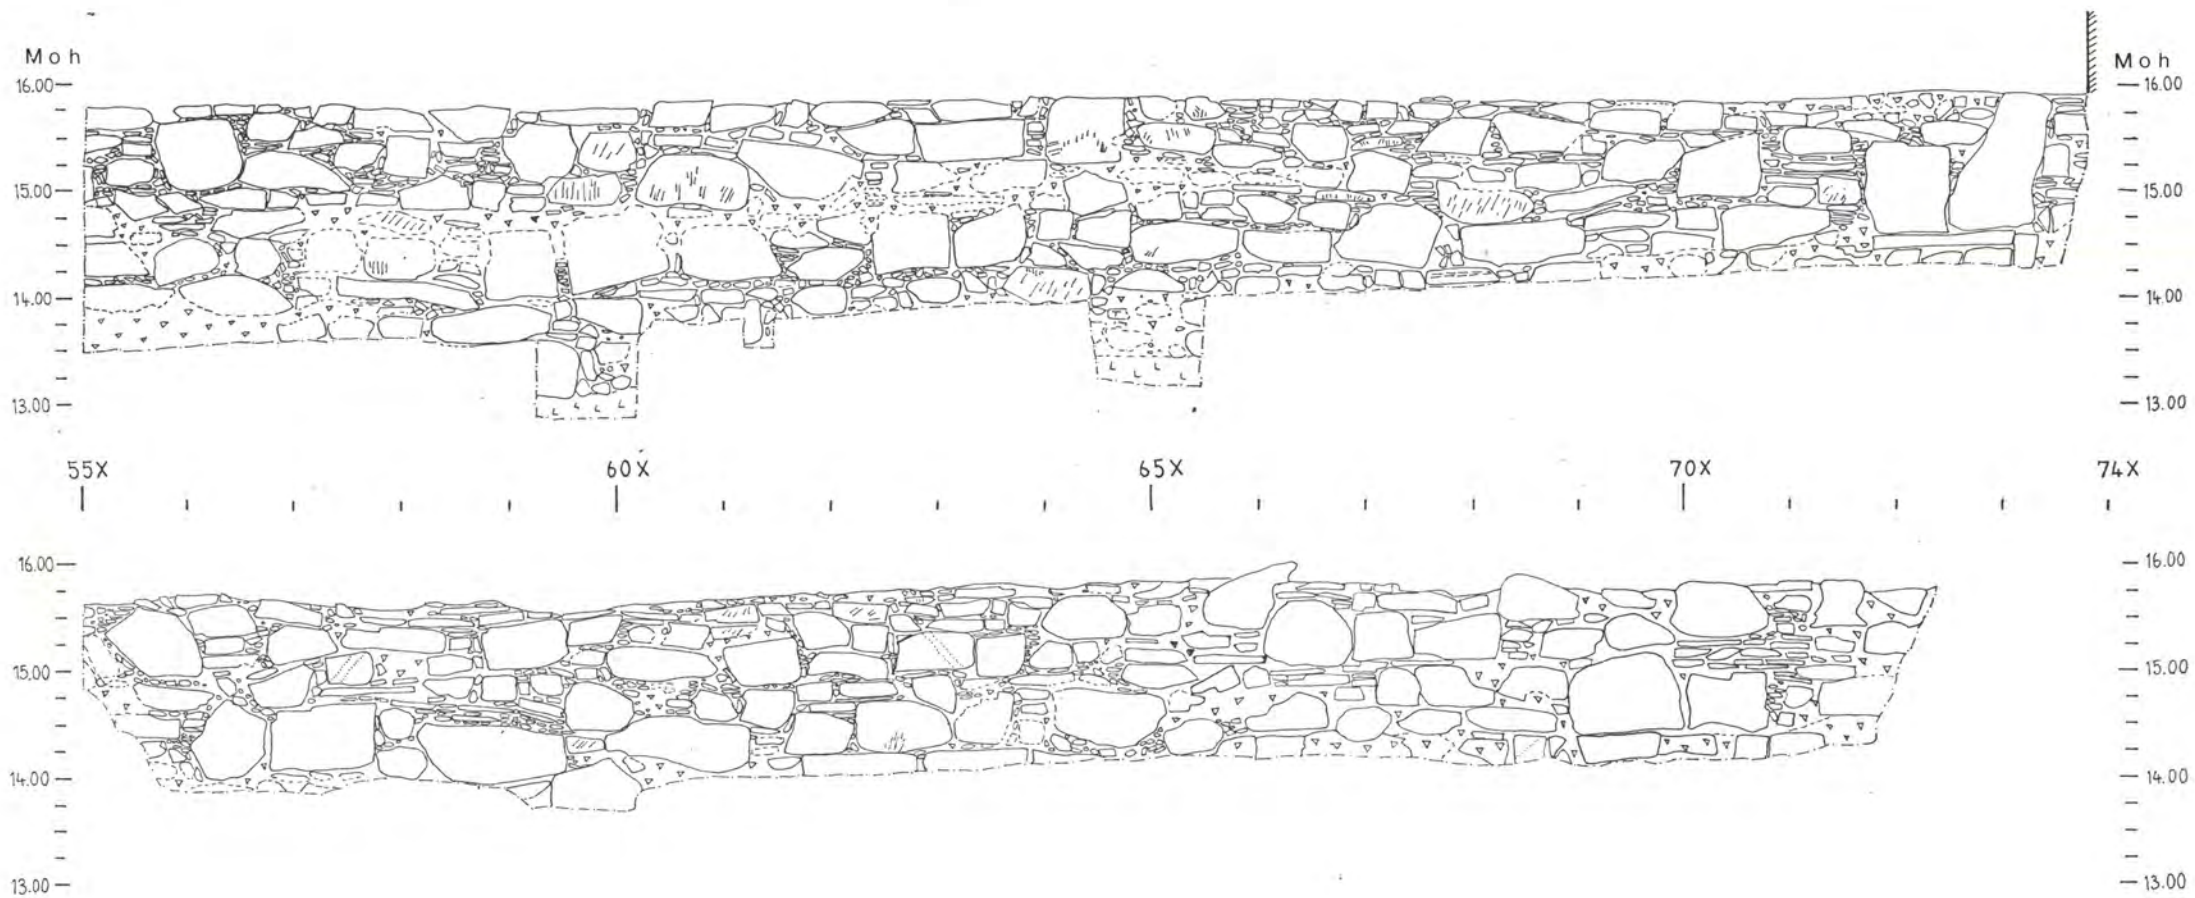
Curtain wall AK2=BK1: east-facing elevation (above); west-facing elevation (below)
